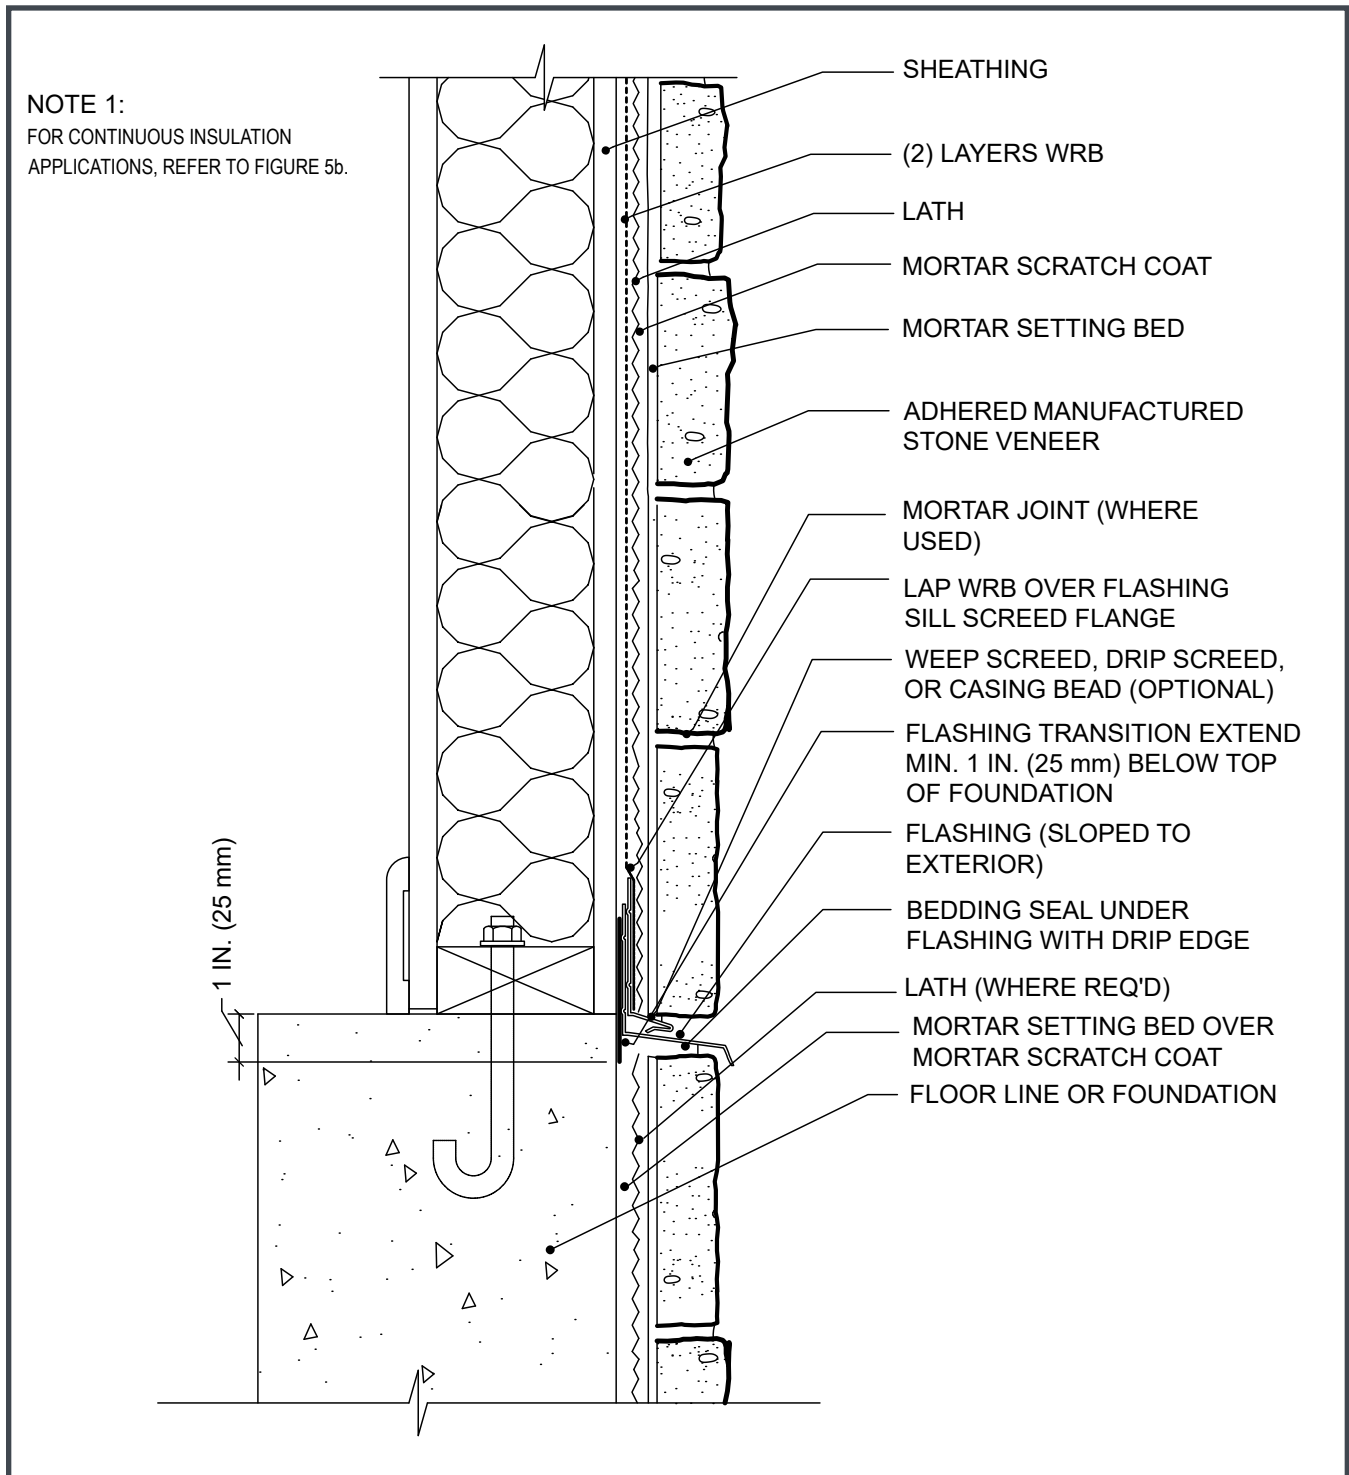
Foundation Wall - Transition to AMSV Continuing Down Foundation
